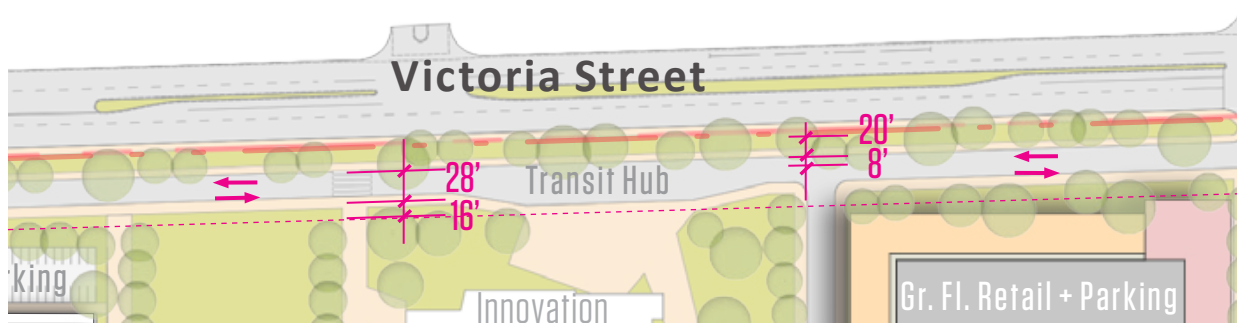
Dominguez Hills Parkway Frontage Road Showing Detail of Roadway Widths at Victoria Street
